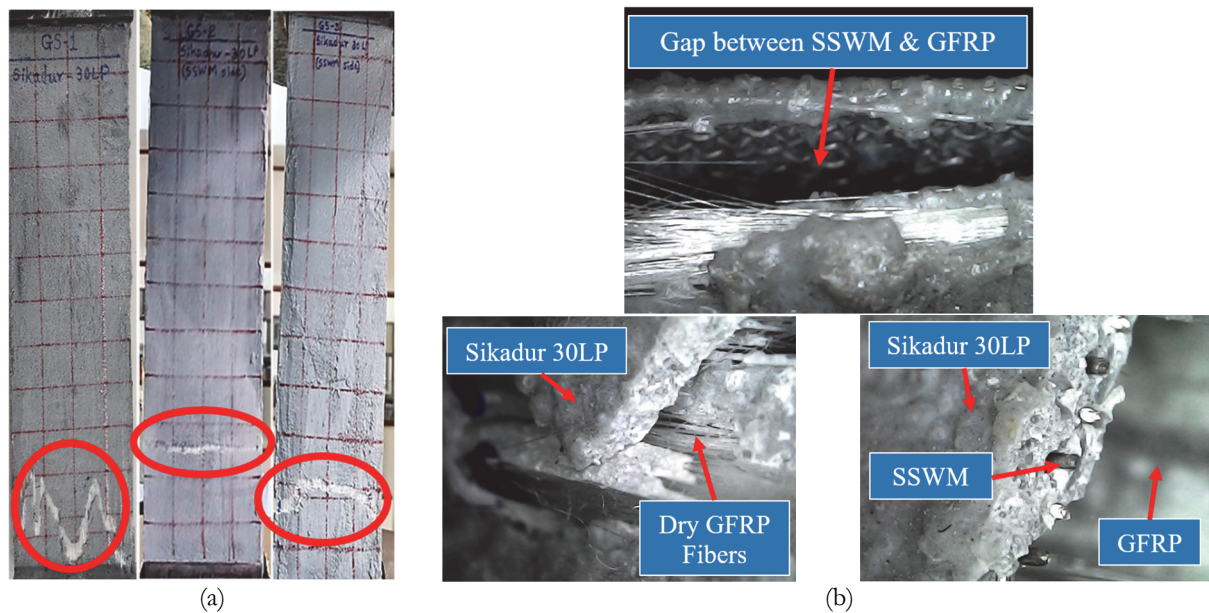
Failure and Fractographic assessment of hybrid coupon specimens prepared using tension assembly frame.
